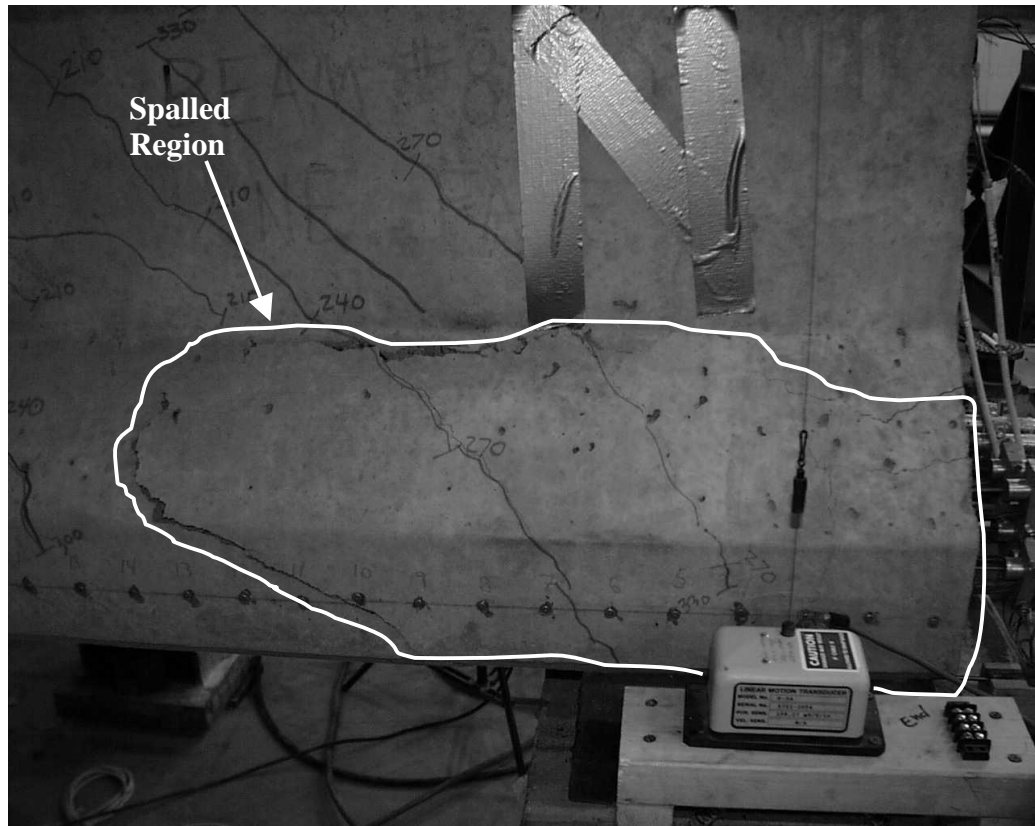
Support Spalling Area (LW8000-2-N-70)
